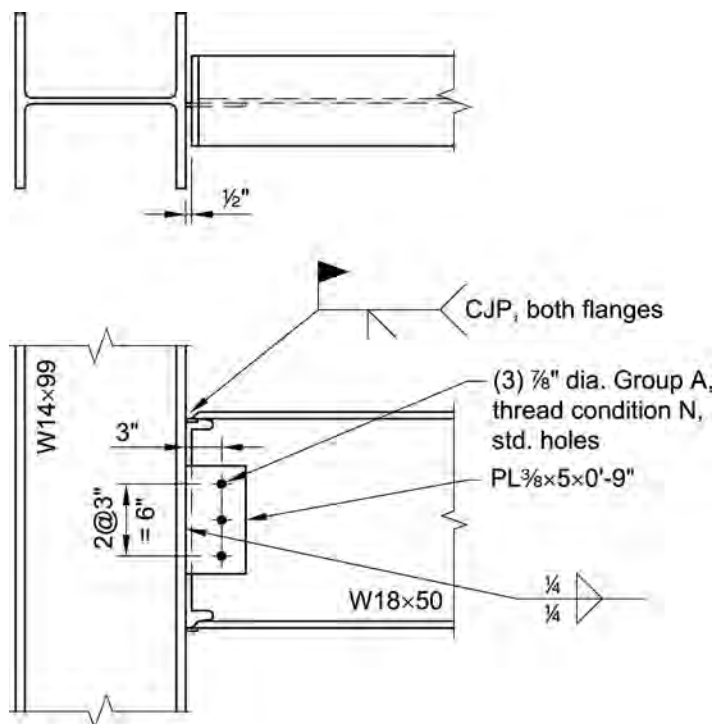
Connection geometry for Example II.B-3.
